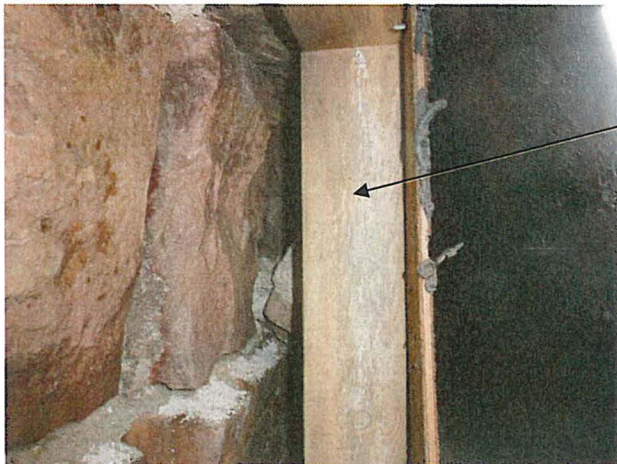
North parapet wall. Note interior course of brick had fallen away from the wall.
